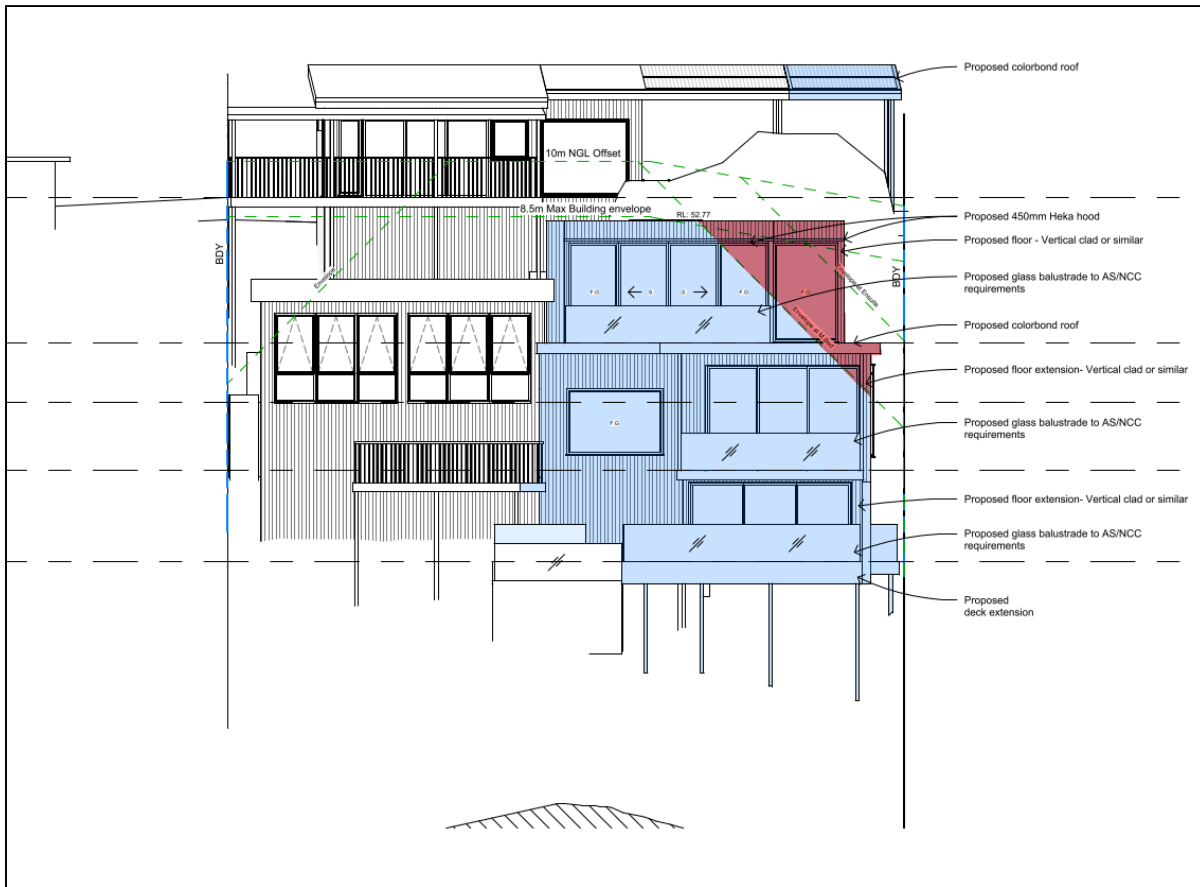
North West Elevation (red highlighting building envelope numerical non-compliance)
